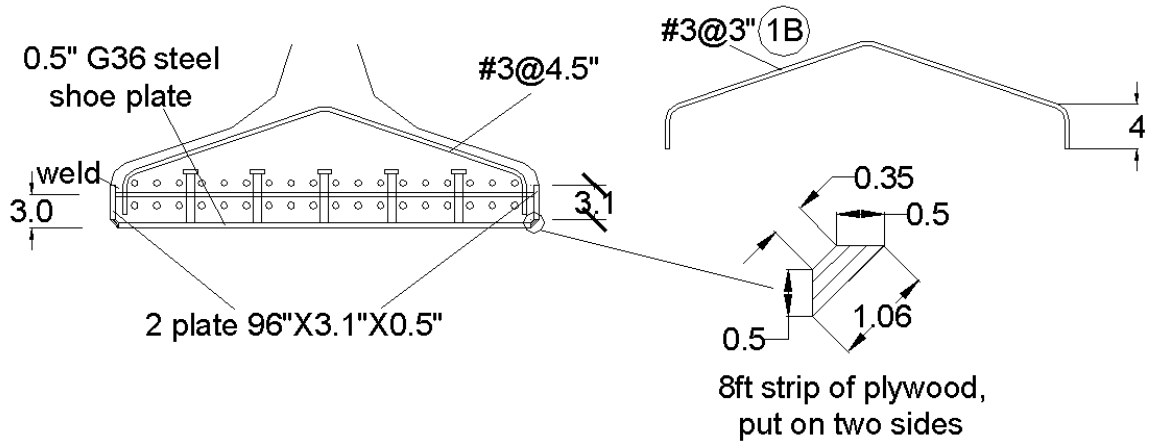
Strengthened Precast Girder Bottom Flange with Shoe Plate
